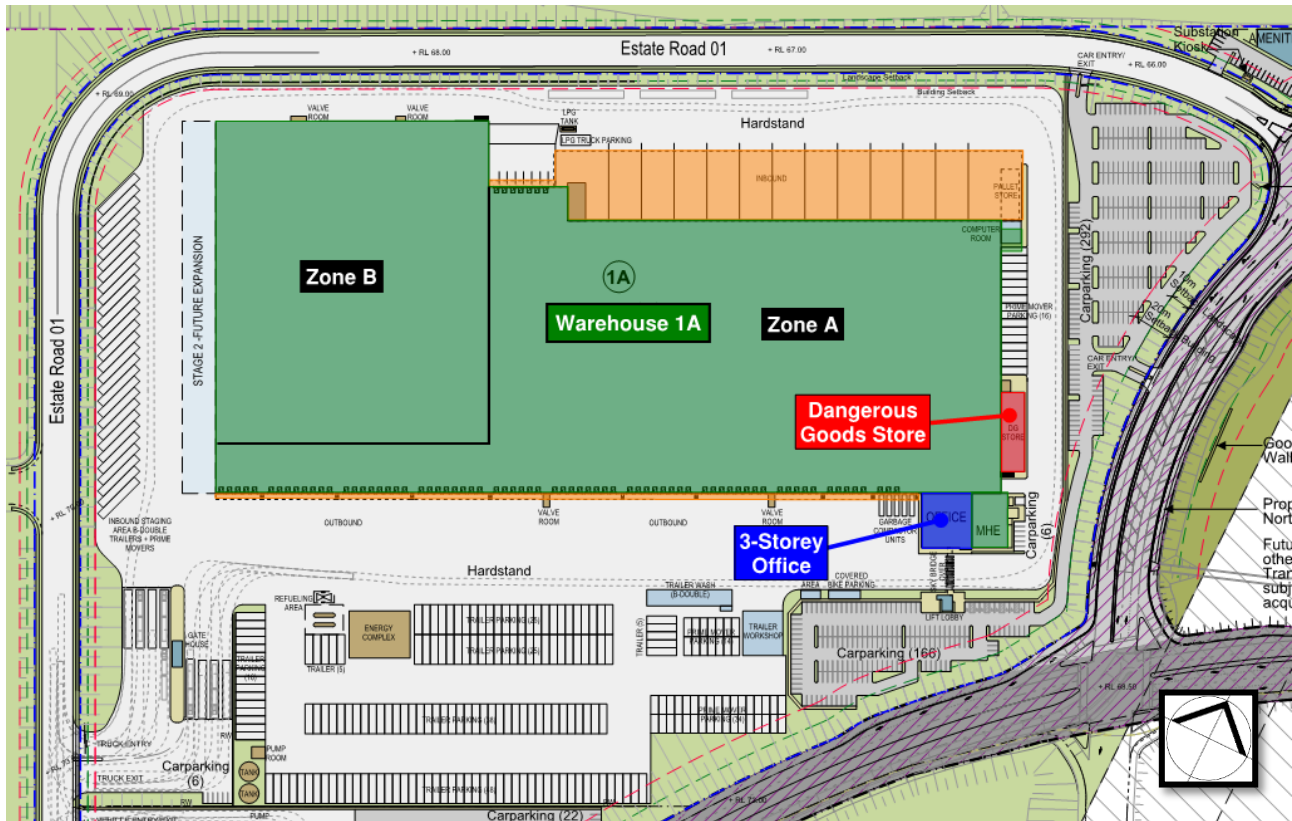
Oakdale West Precinct 1 Site Plan – Lot 1A
